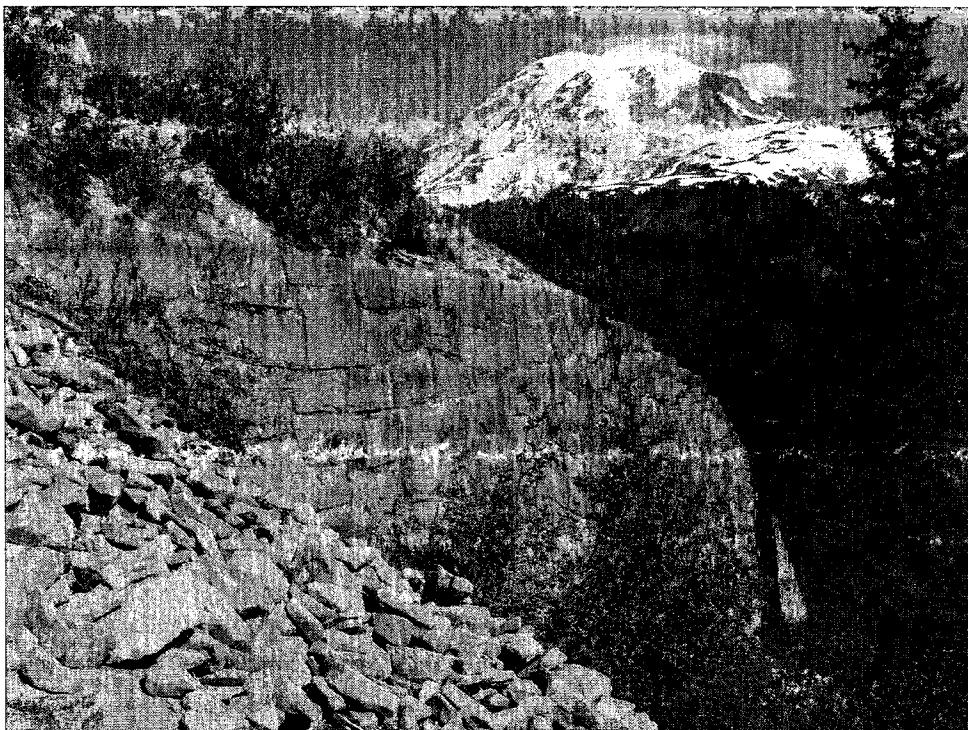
Contemporary photo showing contributing mortared retaining wall (MORA 2004).
